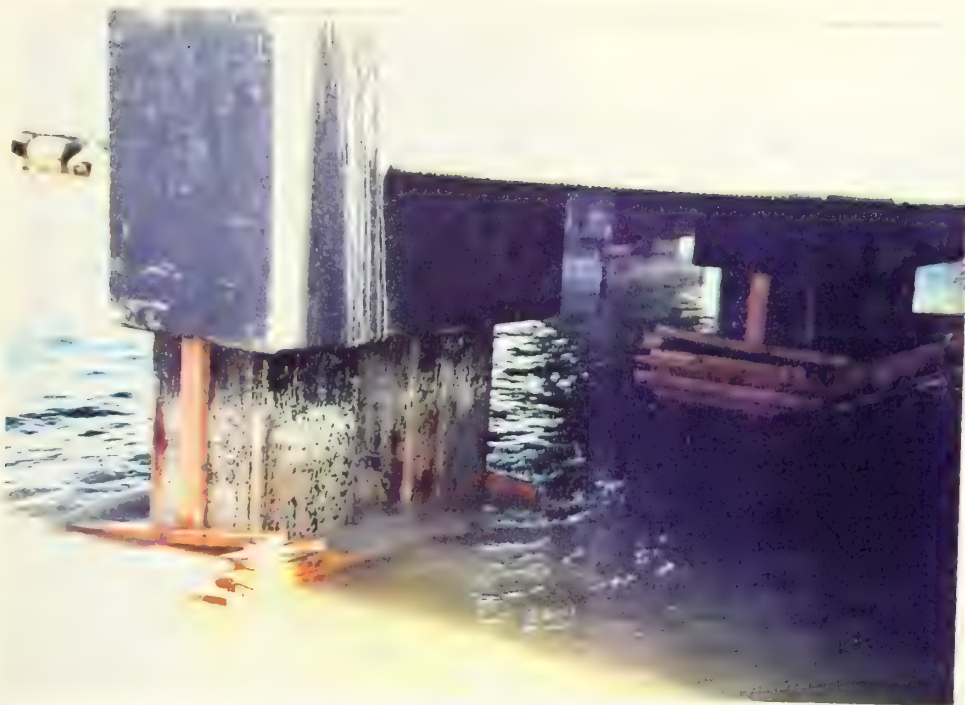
Eight feet high forms and unusual high tide posed a problem before concrete placement on piles A1-A4
